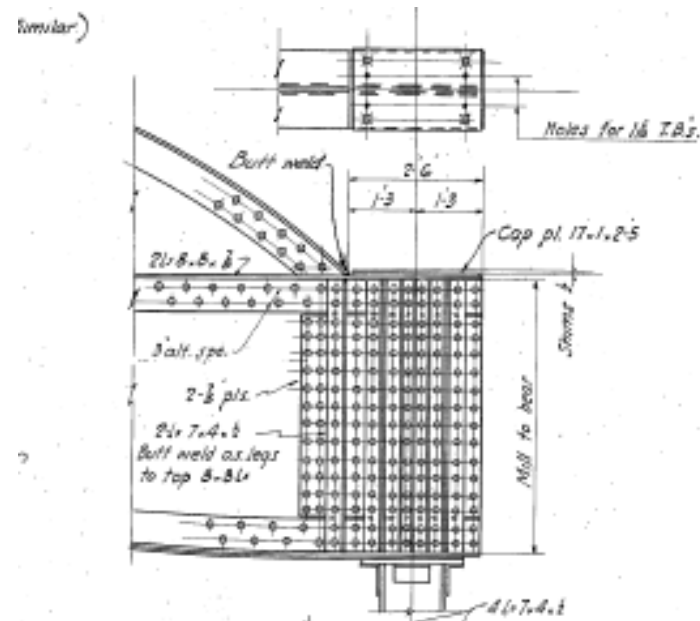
Detail of Connection to Main Trunnion Column (1939 As-Built Plans)
